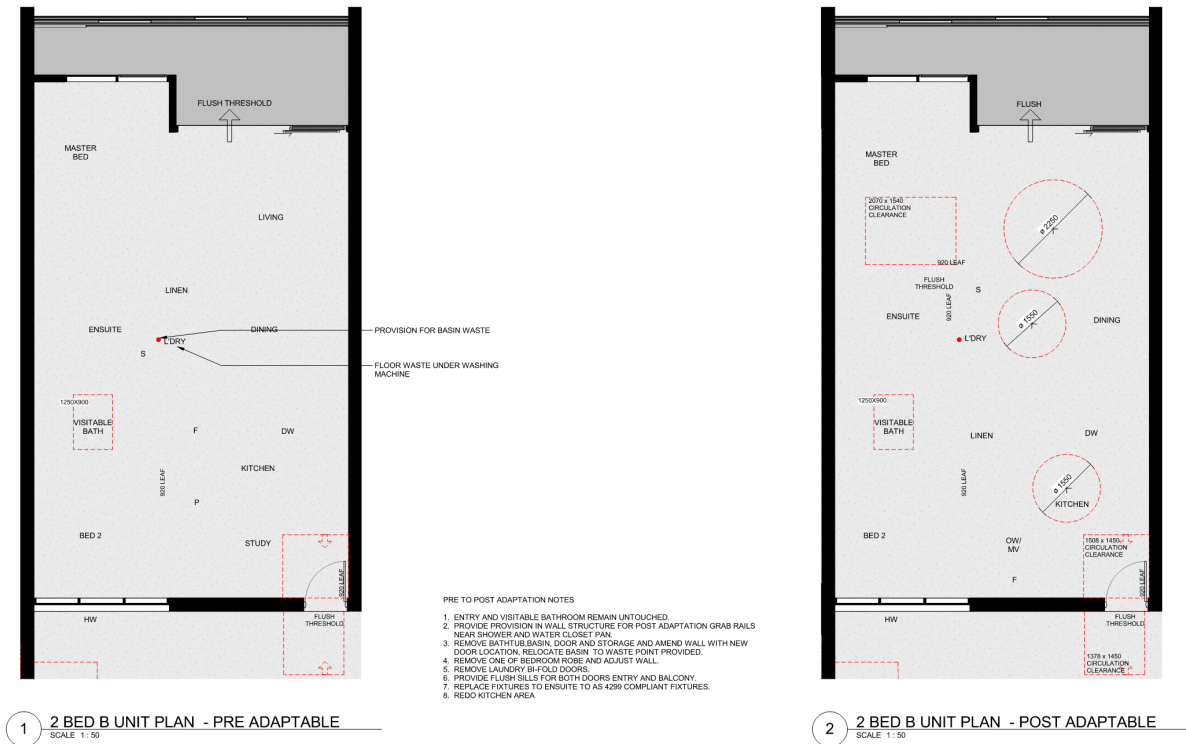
Two bedroom apartment type 2 (pre/post adaptation)
